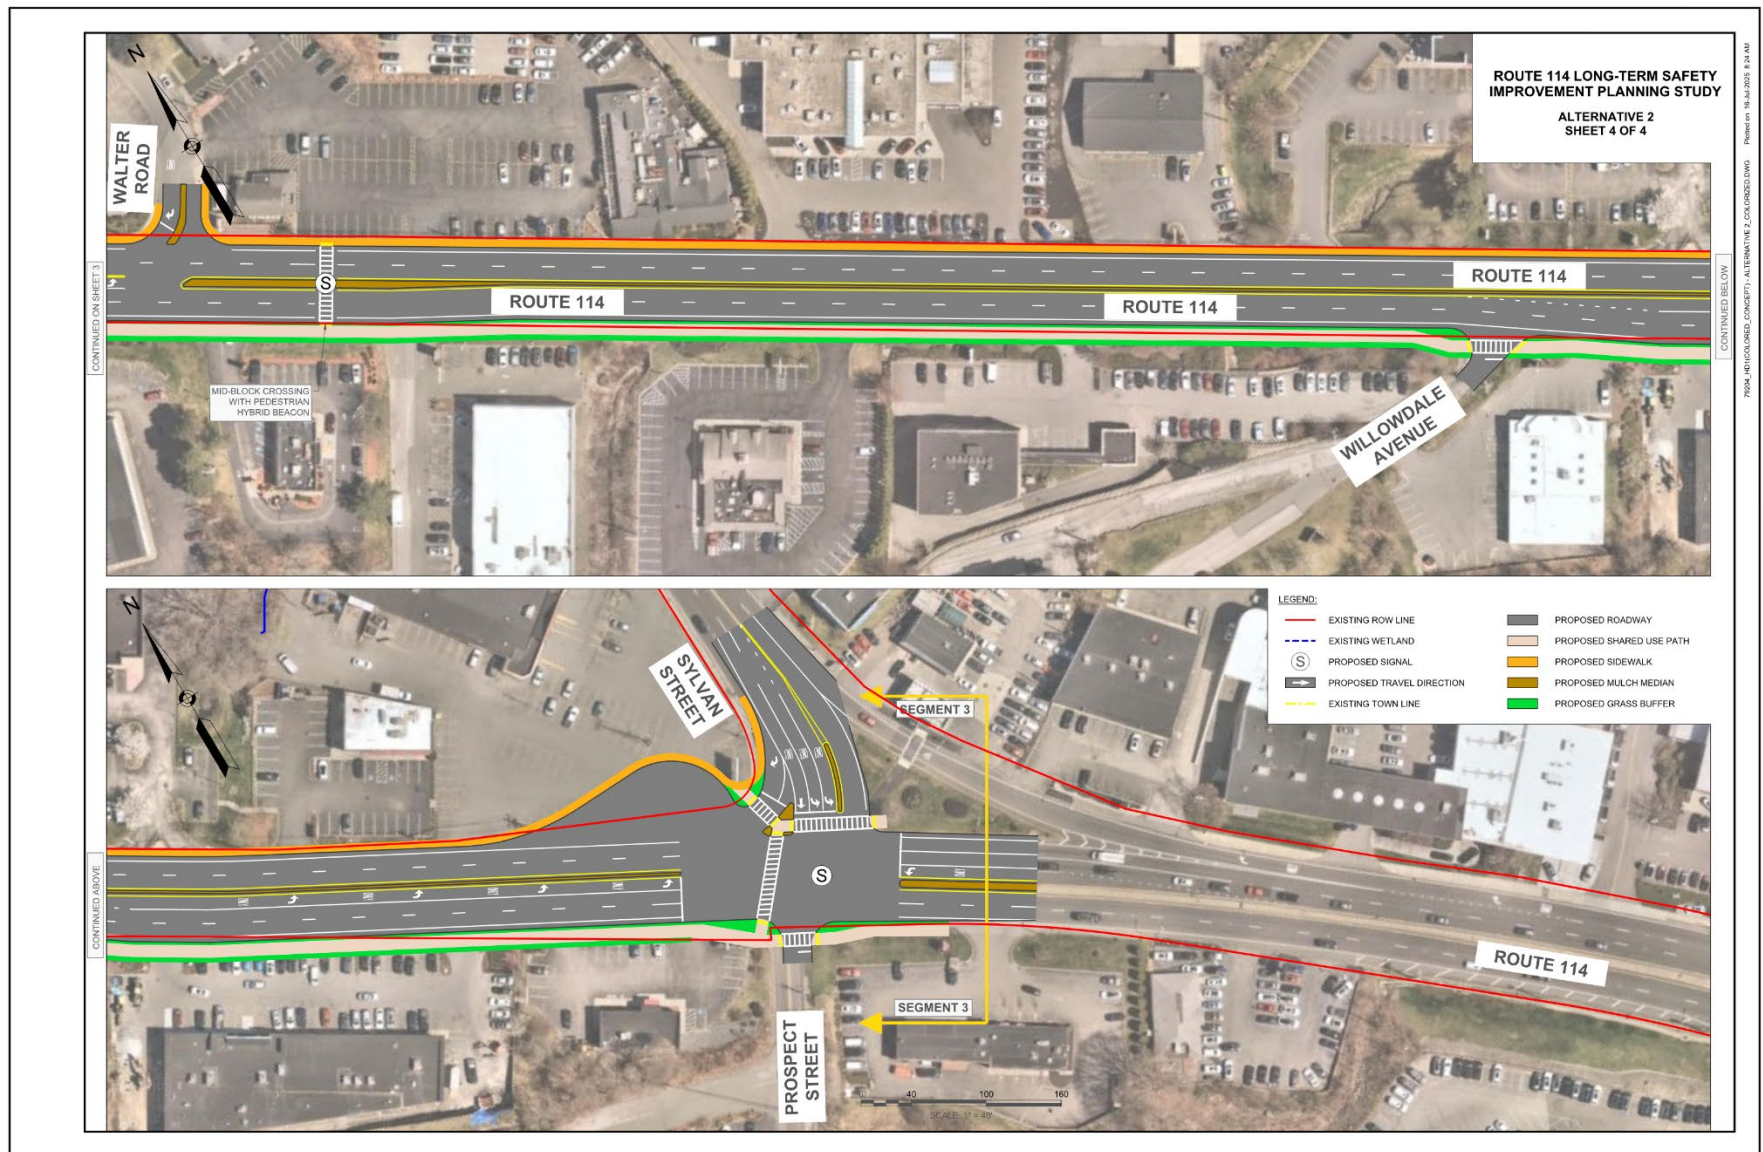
Palmer Avenue to Sylvan Street, Alternative 2, Part 4
